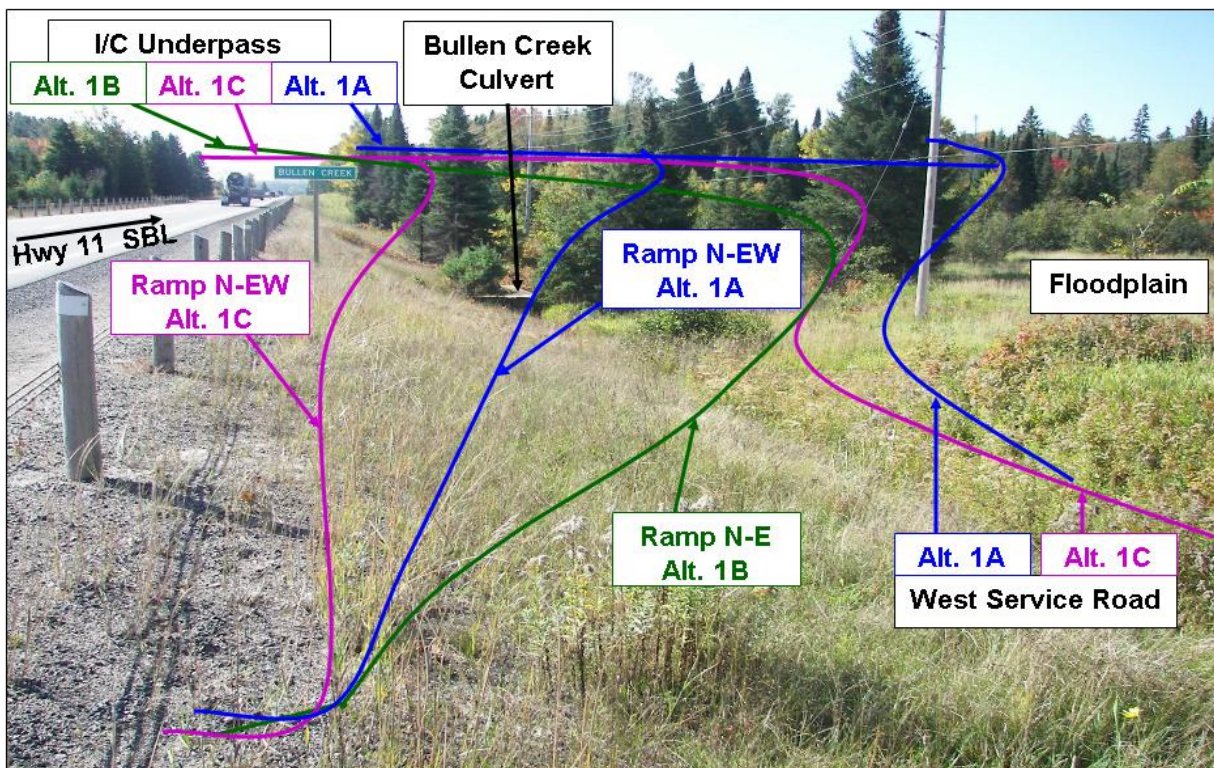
VIEW: Looking north from west shoulder rounding of Highway 11 SBL at Sta. 20+700 across the west end of Bullen Creek culvert. Note that current ramp alternatives require the extension of the culvert westerly. (Sept. 26, 2008)
